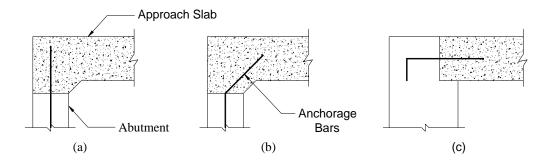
Anchorage bar layout in approach slab-abutment connection
